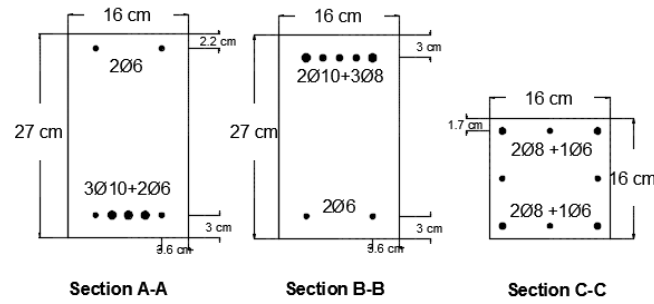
Cross-sections of columns and beams in reduced scale rc frames
